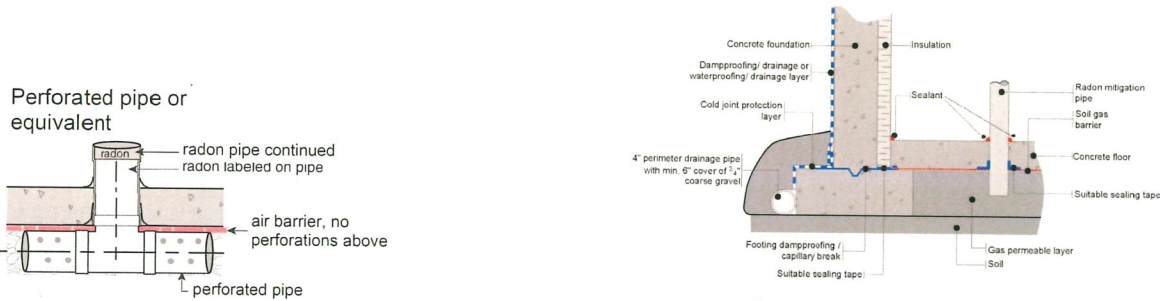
Sealing sub-slab membrane horizontally to concrete footing when insulation is between the foundation wall and floor slab
